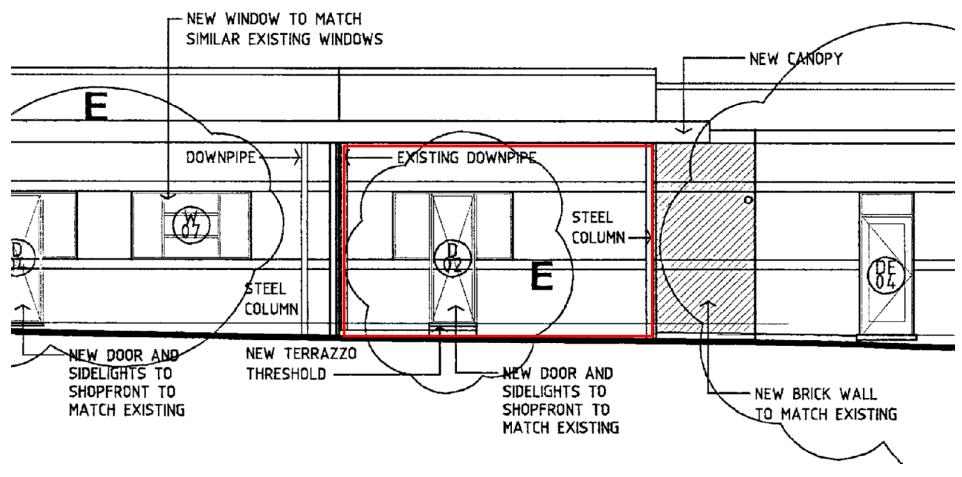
Detail of 1994 elevation of 1994 station upgrades (Source: Sydney Trains Plan Room, EDMS CV0073256).
